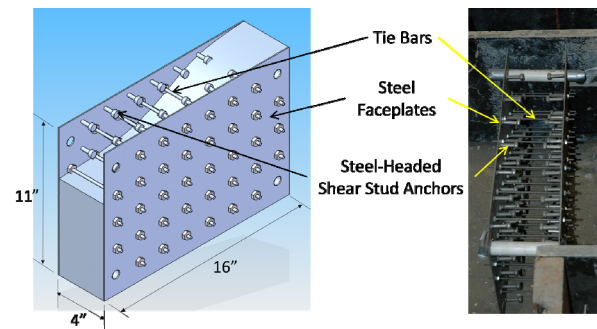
Three-dimensional rendering and module of SC wall specimen (Kim et al. 2017b)
